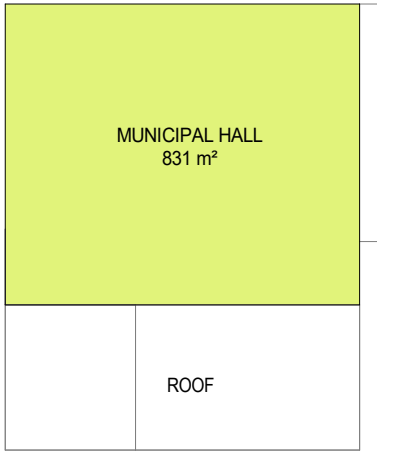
Hovey Road Site Concept: Site Distribution Concept 4
